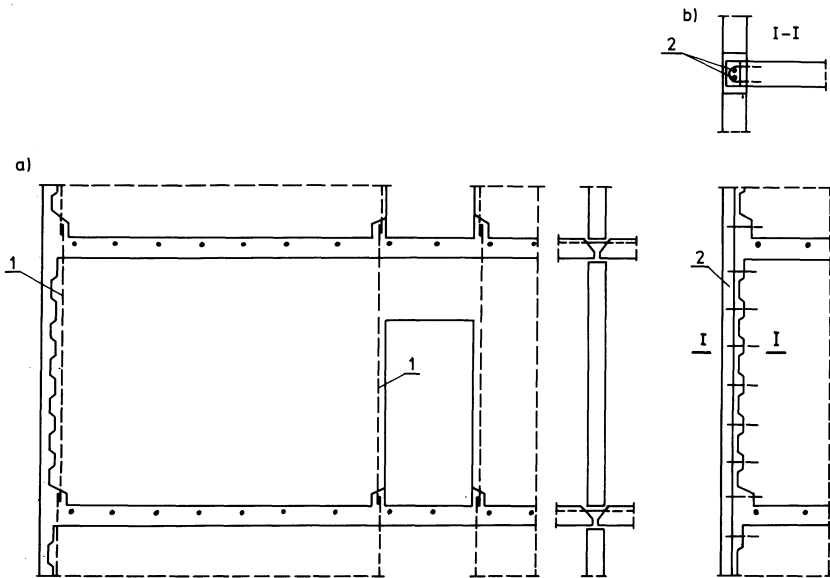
Joints in walls entirely under compression, a. with reinforcement [1] cast into the wall panels, and b. placed in cast-in-situ concrete [2]
